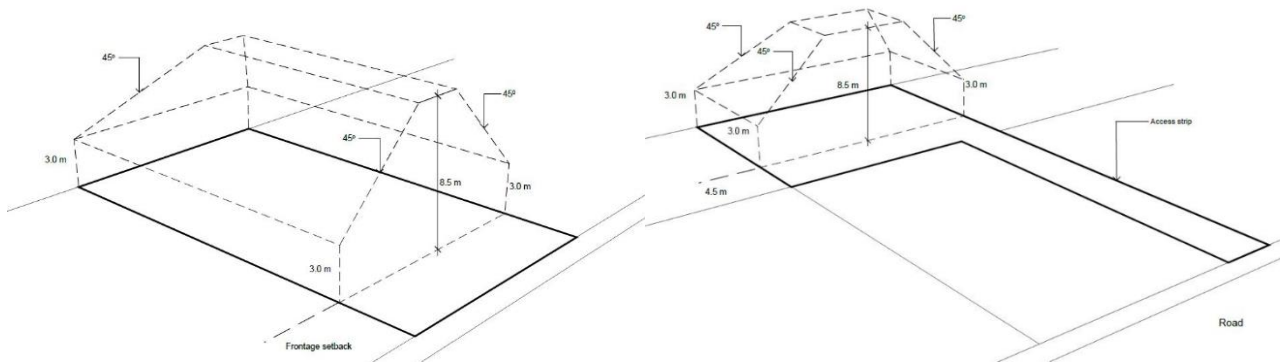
Building envelope for lots as required by clause 8.4.2 A3(a) and clause 8.5.1 A2(a)
